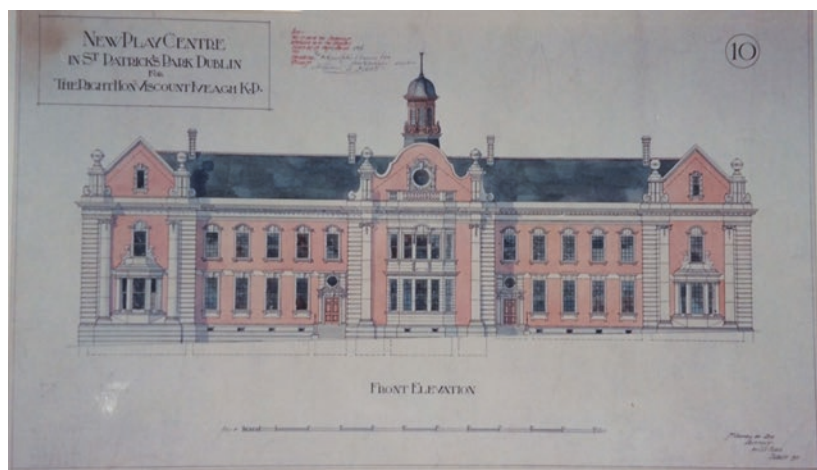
Front elevation, Iveagh Trust Play Centre
